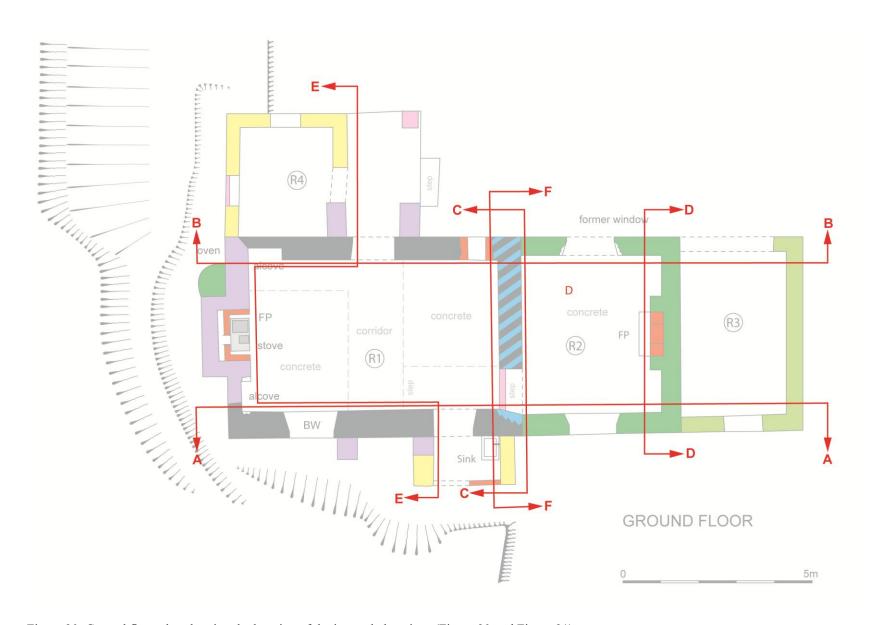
Ground floor plan showing the location of the internal elevations (Figure 20 and Figure 21).
